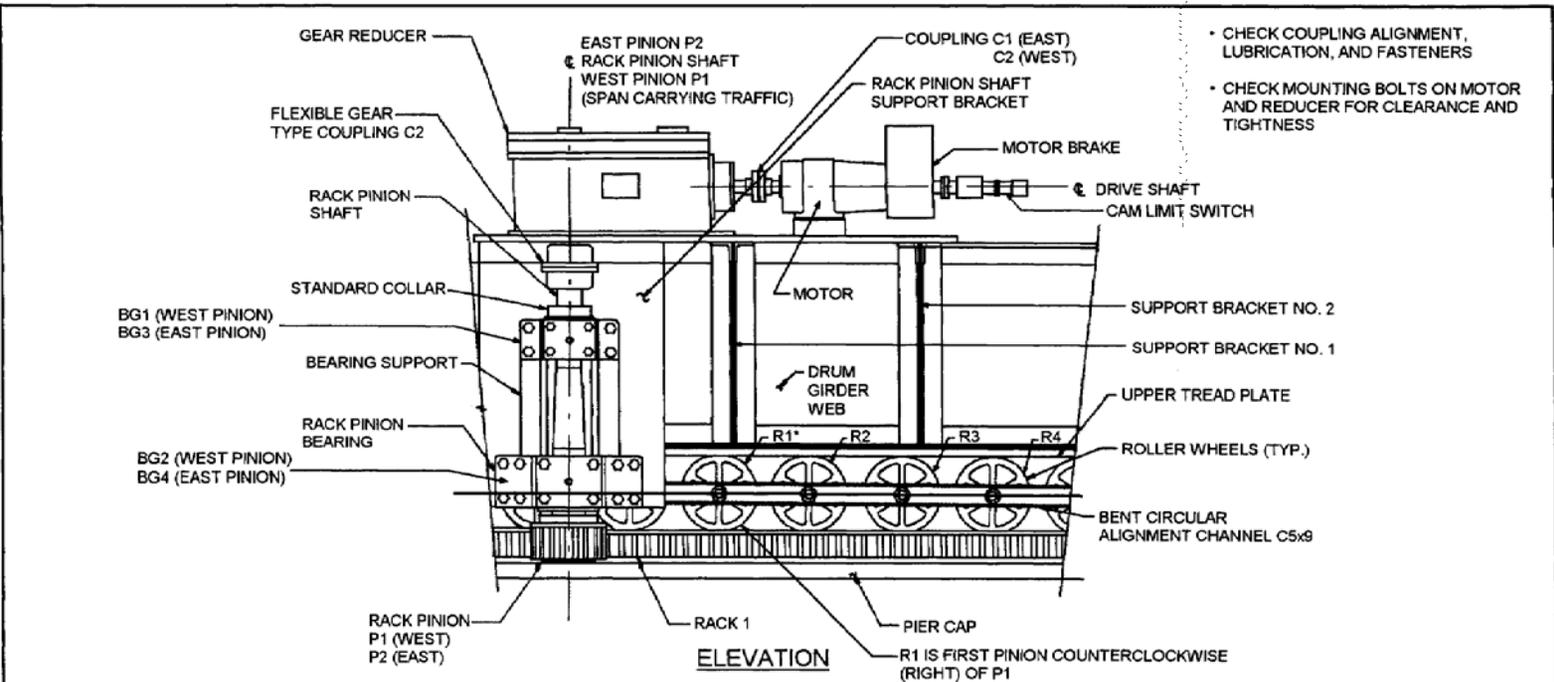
Typical drive machinery layout sketch of a bascule bridge
